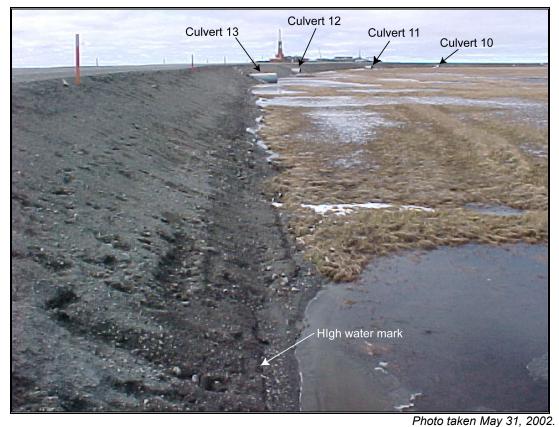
Facing west from Culvert 14 along the north side of the CD-2 access road.
